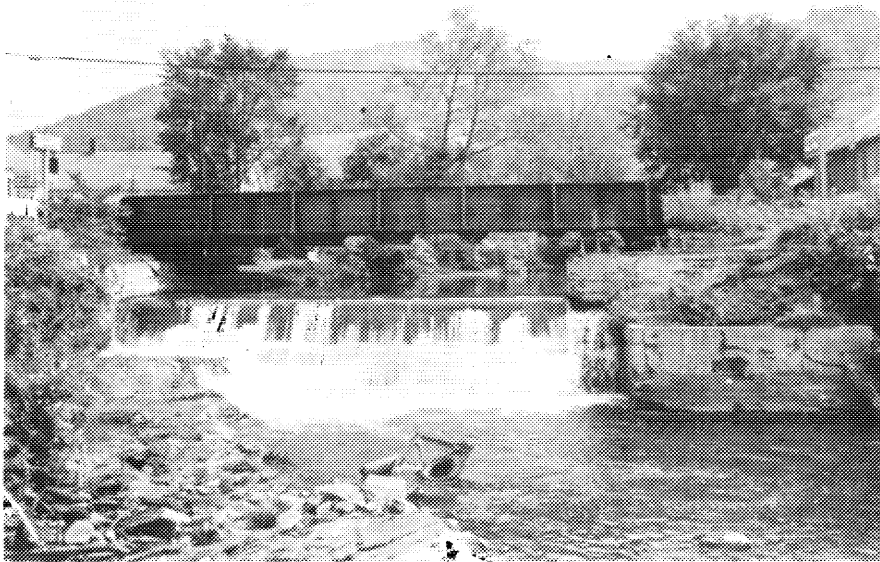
Second Branch - CVPS dam and Route 14 highway
